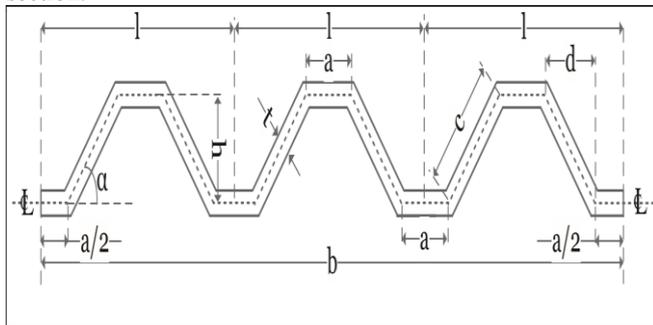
Trapezoidal corrugated plate cross section and dimension notation
